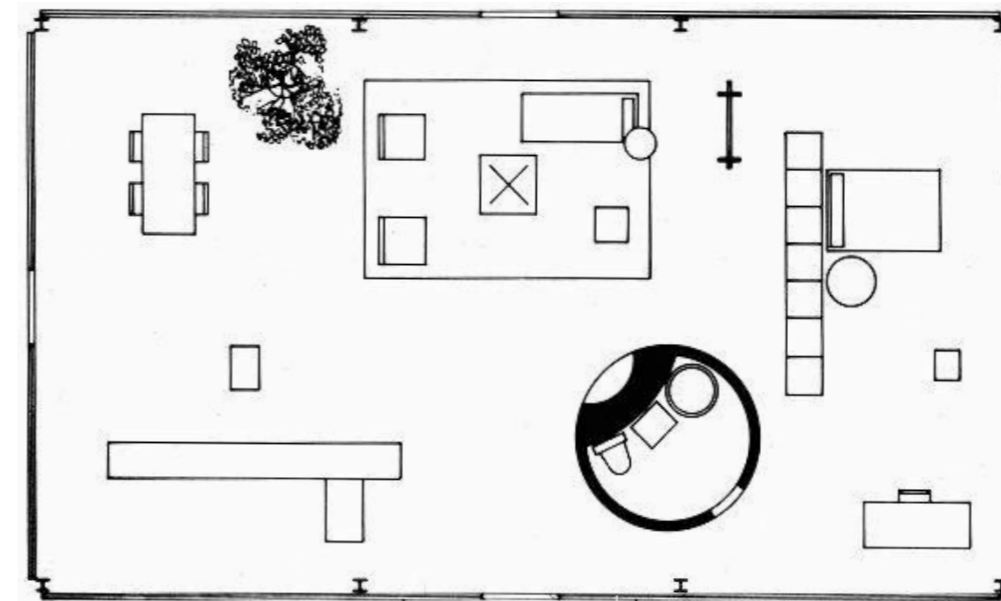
Glass House floor plan (Philip Johnson, 1949)
